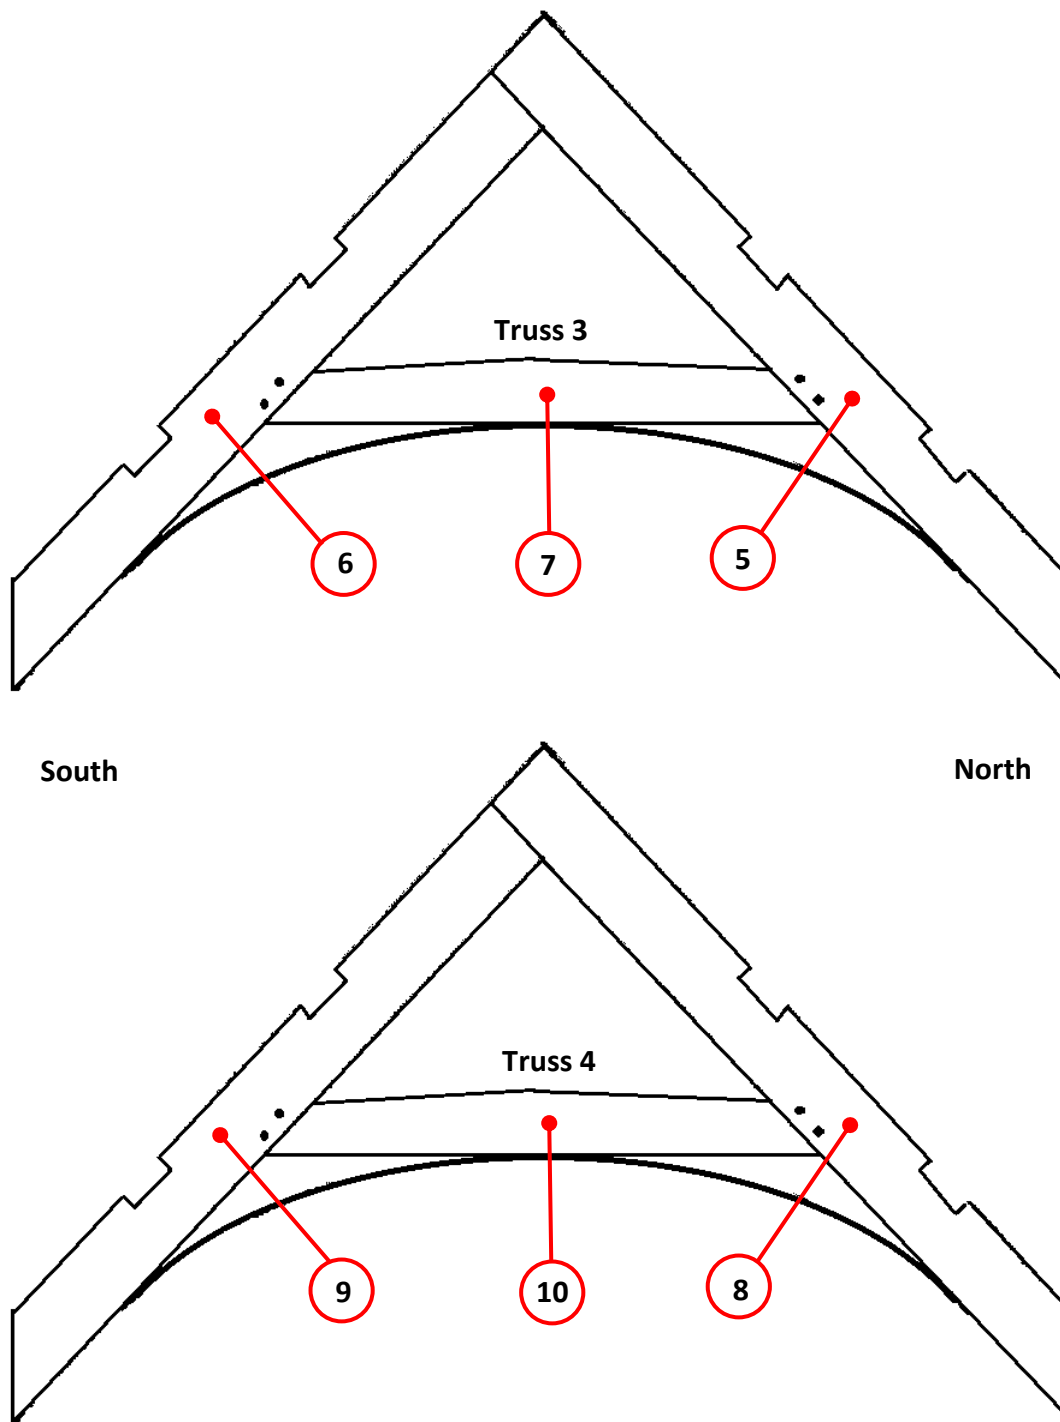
/d: Simple schematic drawings of the south range roof trusses to locate the sampled timbers
